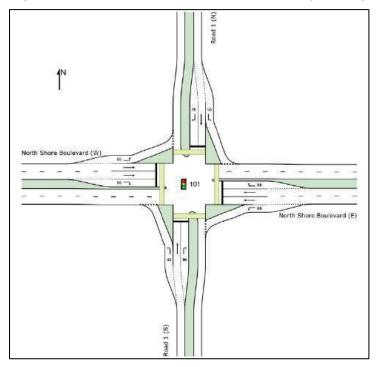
North Shore Boulevard / Road 1 | Ultimate SIDRA Layout
